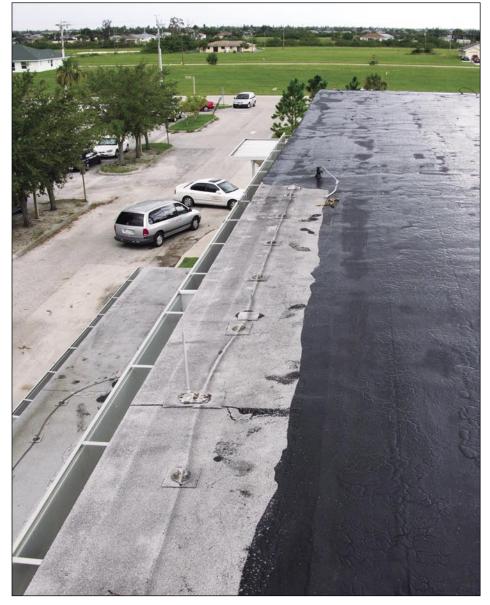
The edge flashing had a 2-inch vertical flange that extended into the gutter. The flashing was not cleated (Cape Coral). A high school in Arcadia had an aggregate surface BUR over lightweight insulating concrete (LWIC) over steel form deck that had been installed in the mid-1970s. Two areas over the cafeteria blew off, as did a portion over the gym. Repairs had been made by the time the MAT inspected, so it was not possible to definitively determine the cause of the failures. The failures at the cafeteria occurred several feet from the parapet. These failures may have been due to base sheet rupture around the fasteners (which may have been due to spacing problems, fastener corrosion, or deterioration of the base sheet), or deformation or cracking of the LWIC. At the gym roof, the blow-off area extended to the parapet, but it was unclear if the blow-off originated at the parapet. This roof may have failed for the reasons given at the cafeteria, or this failure may have been related to the coping or base flashing attachment. The 13¹/₂-inch-wide coping was attached only at each coping joint with three nails in the horizontal flange and one in the vertical flange. There was significant water infiltration in the cafeteria and gym.
